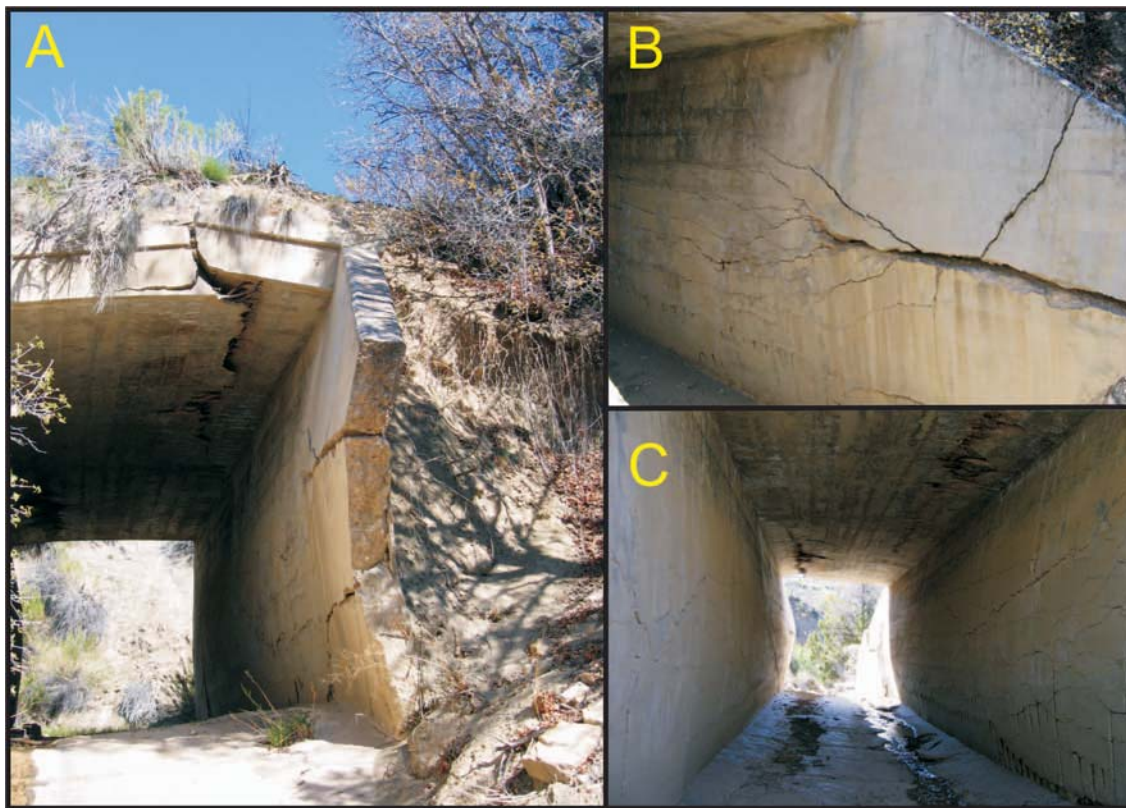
Damage to box culvert at abandoned SR-15 crossing of Little Meadow Creek. Damage suggests historical movement downslope of landslide 2. A) View upstream showing damage to northeast wall of box culvert and upper deck. B) Damage to northeast wall of box culvert. C) View downstream of interior of culvert showing hourglass distortion of originally rectangular box culvert.
